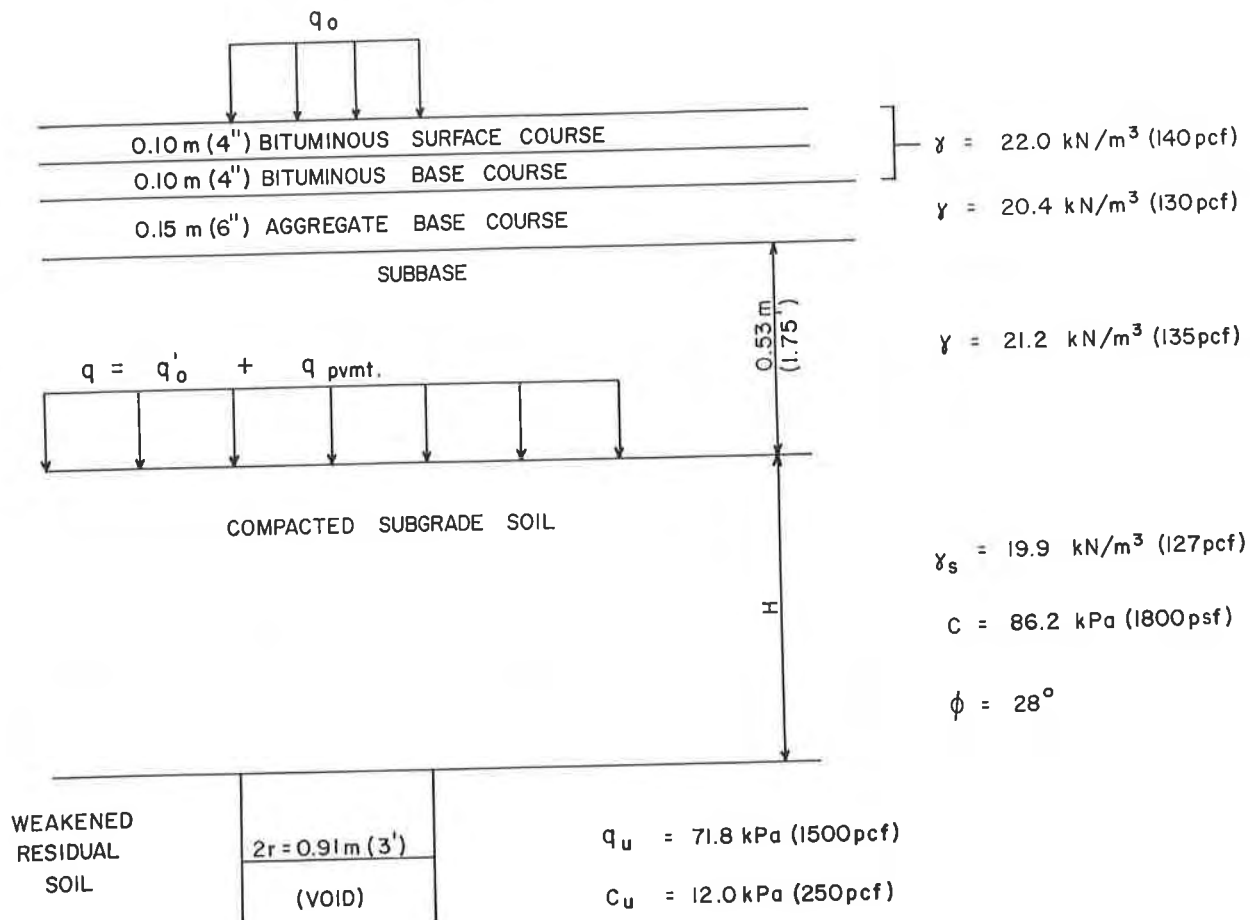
Pavement and subgrade cross-section, ABE International Airport.
